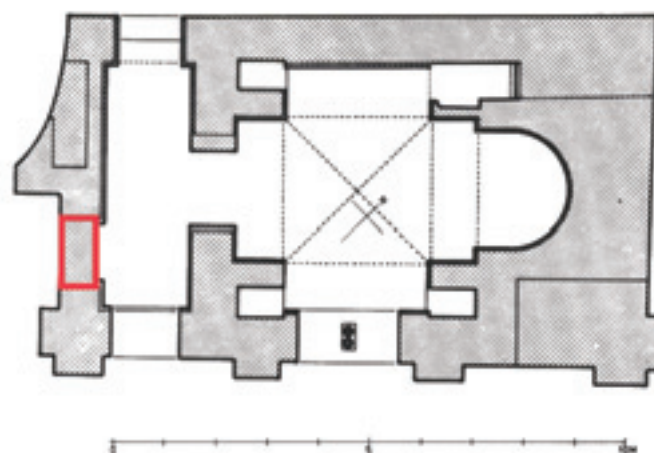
Floor plan showing the original entrance (after Deichmann, Ravenna, pl. 12)
